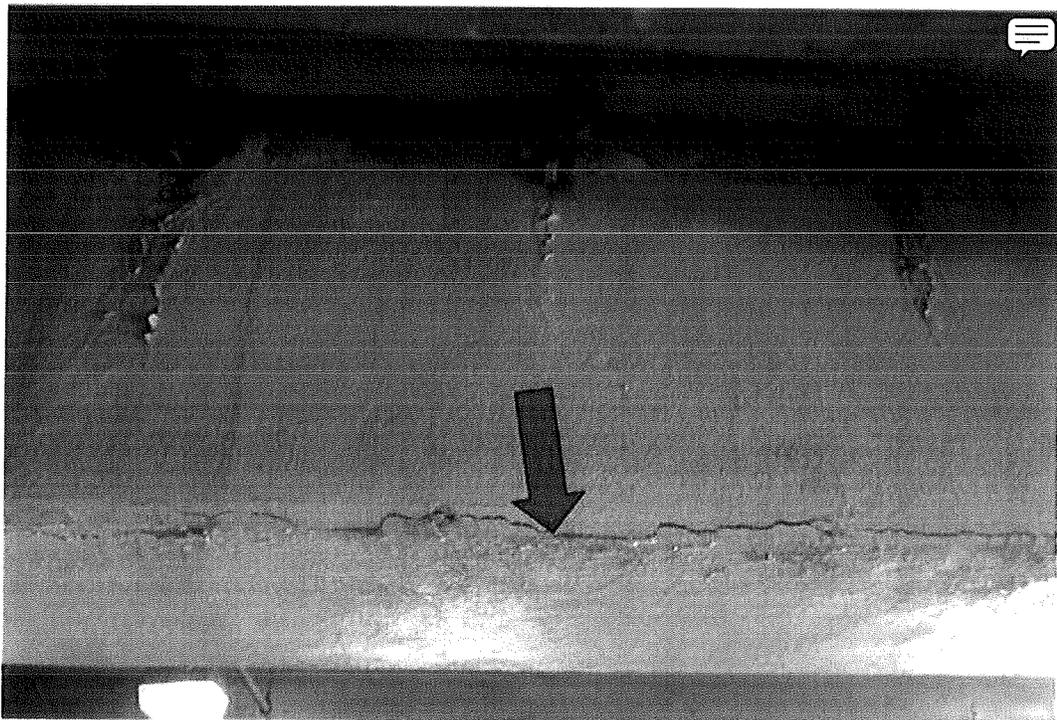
Cracked and hollow sounding underside of concrete truss member. Along Column Line 7, between Column Lines U5 & U6 at the underside of Parking Level 7. (Approx. 4 SF)
